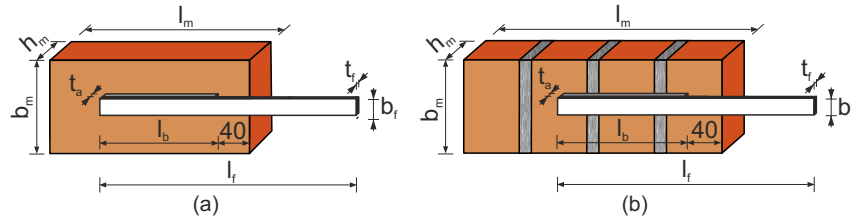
Geometry of the specimens: (a) brick; (b) masonry block.
